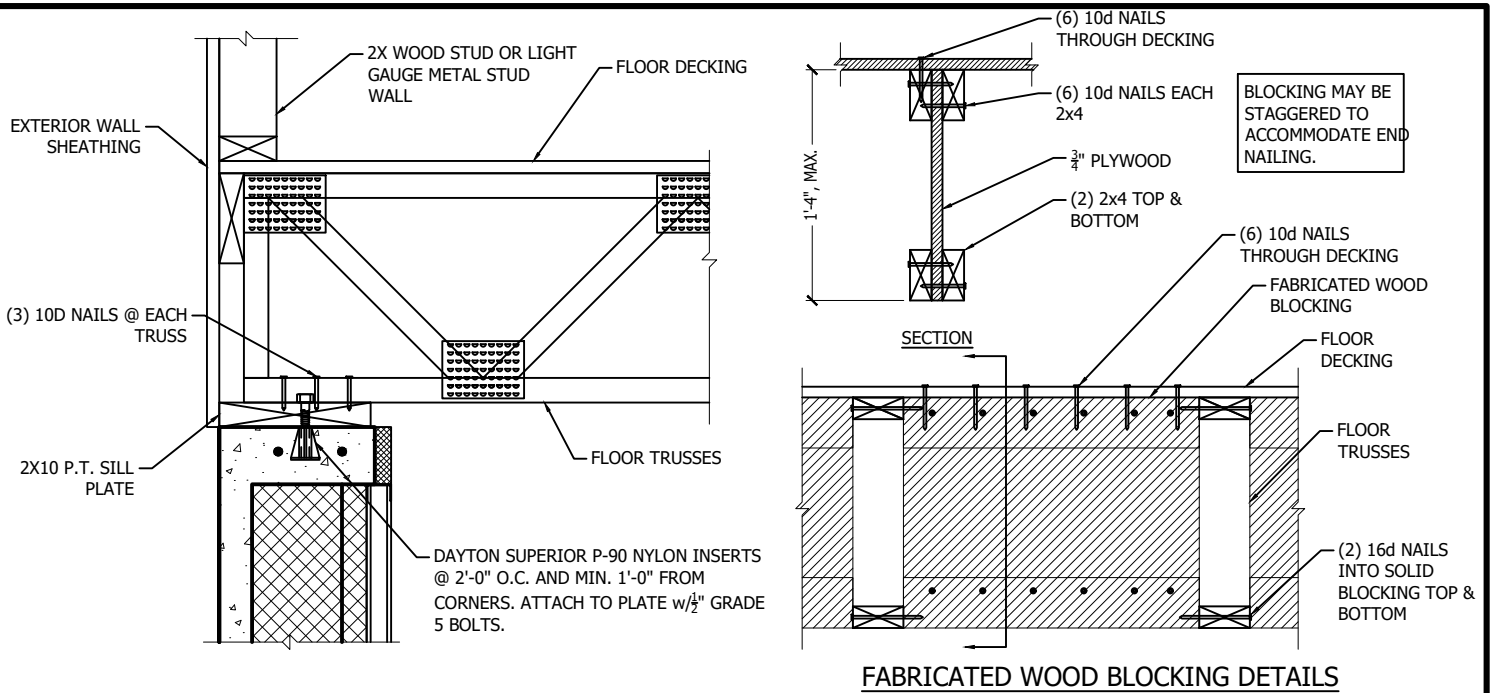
FLOOR TRUSS PERPENDICULAR TO WALL
